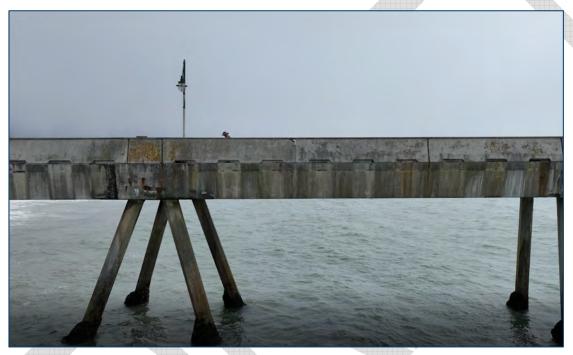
Deck Exterior around Bent 1E and Bent 1F - North Face
